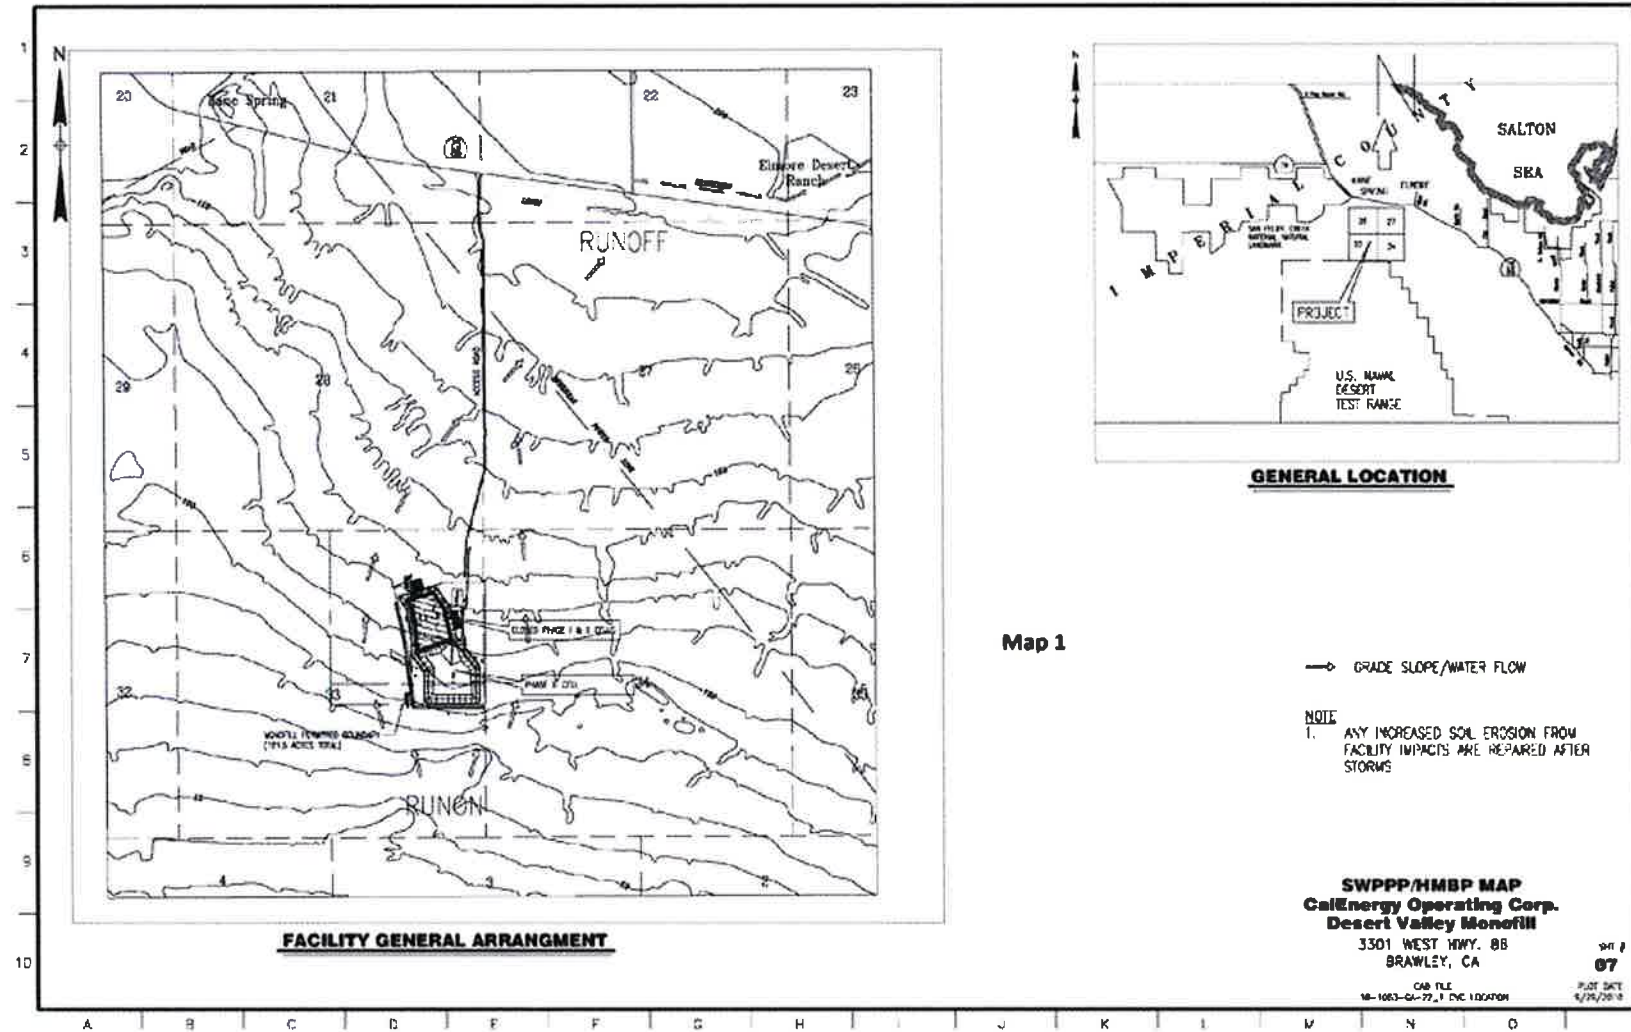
SITE PLAN, DVC ACCESS ROAD
